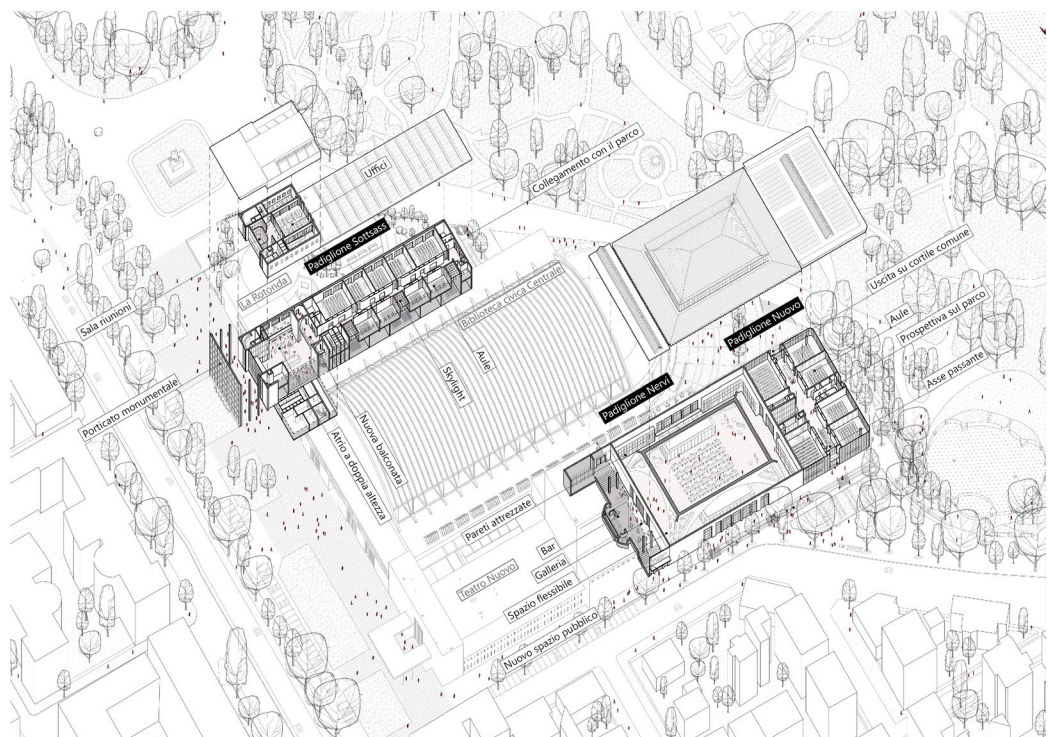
Detail axonometry of Pavilions I (Ettore Sottsass sr), 3A (Pierluigi Nervi) and the New Pavilion (elaboration: Masterplan Team).
